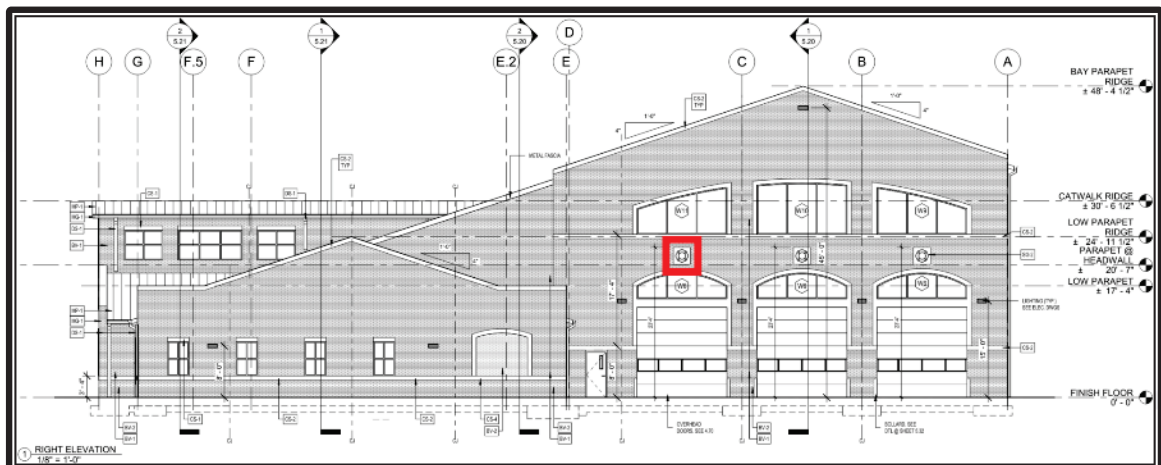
East exterior wall elevation showing the approximate location of Test Area 2 (outlined) (cropped plan courtesy of SCNA).
